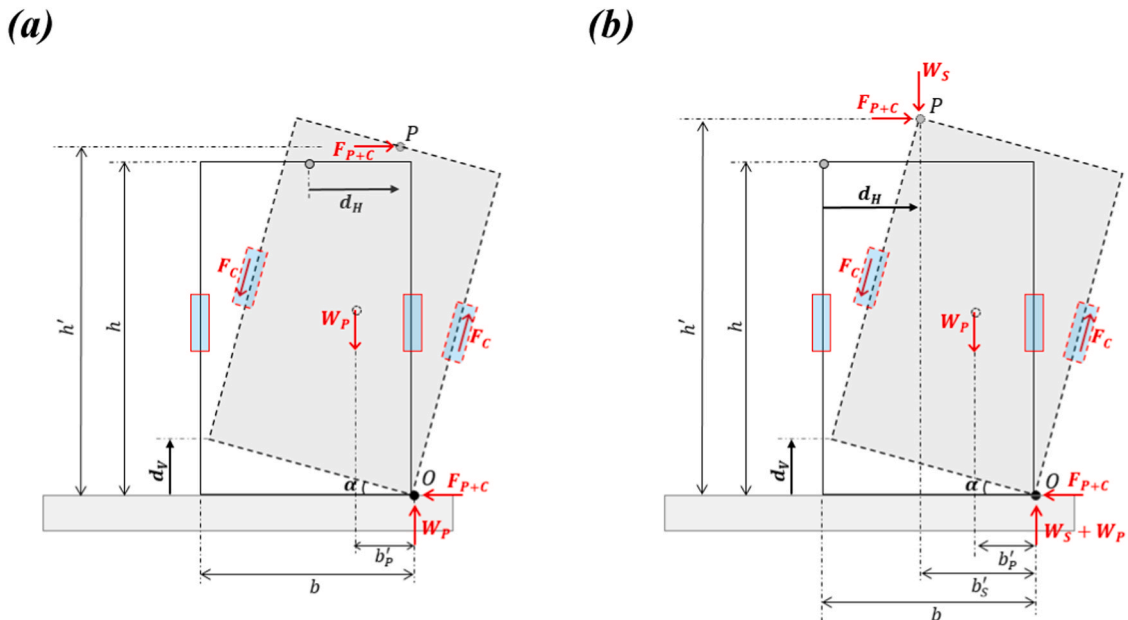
Rocking panel with dissipative connections: (a) “installation scheme-1”, more suitable to r.c. or steel frames; (b) “scheme-2”, more suitable to timber buildings.
